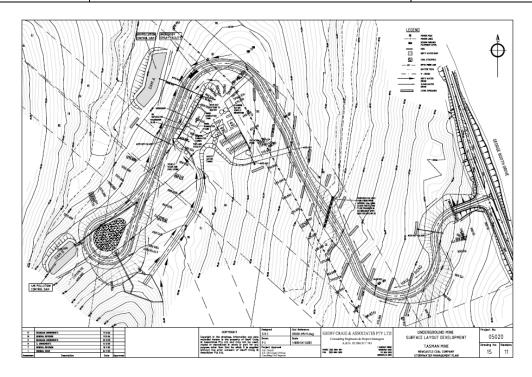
Surface Layout and Drainage Development - Tasman Mine Stormwater Management Plan
